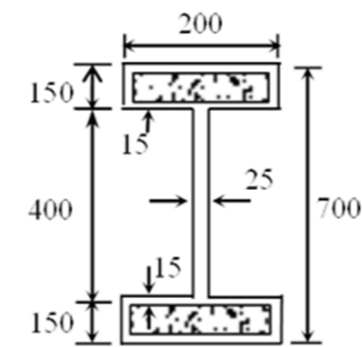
Cross-section of a composite beam with a concrete filled tubular flange (all units in mm)
